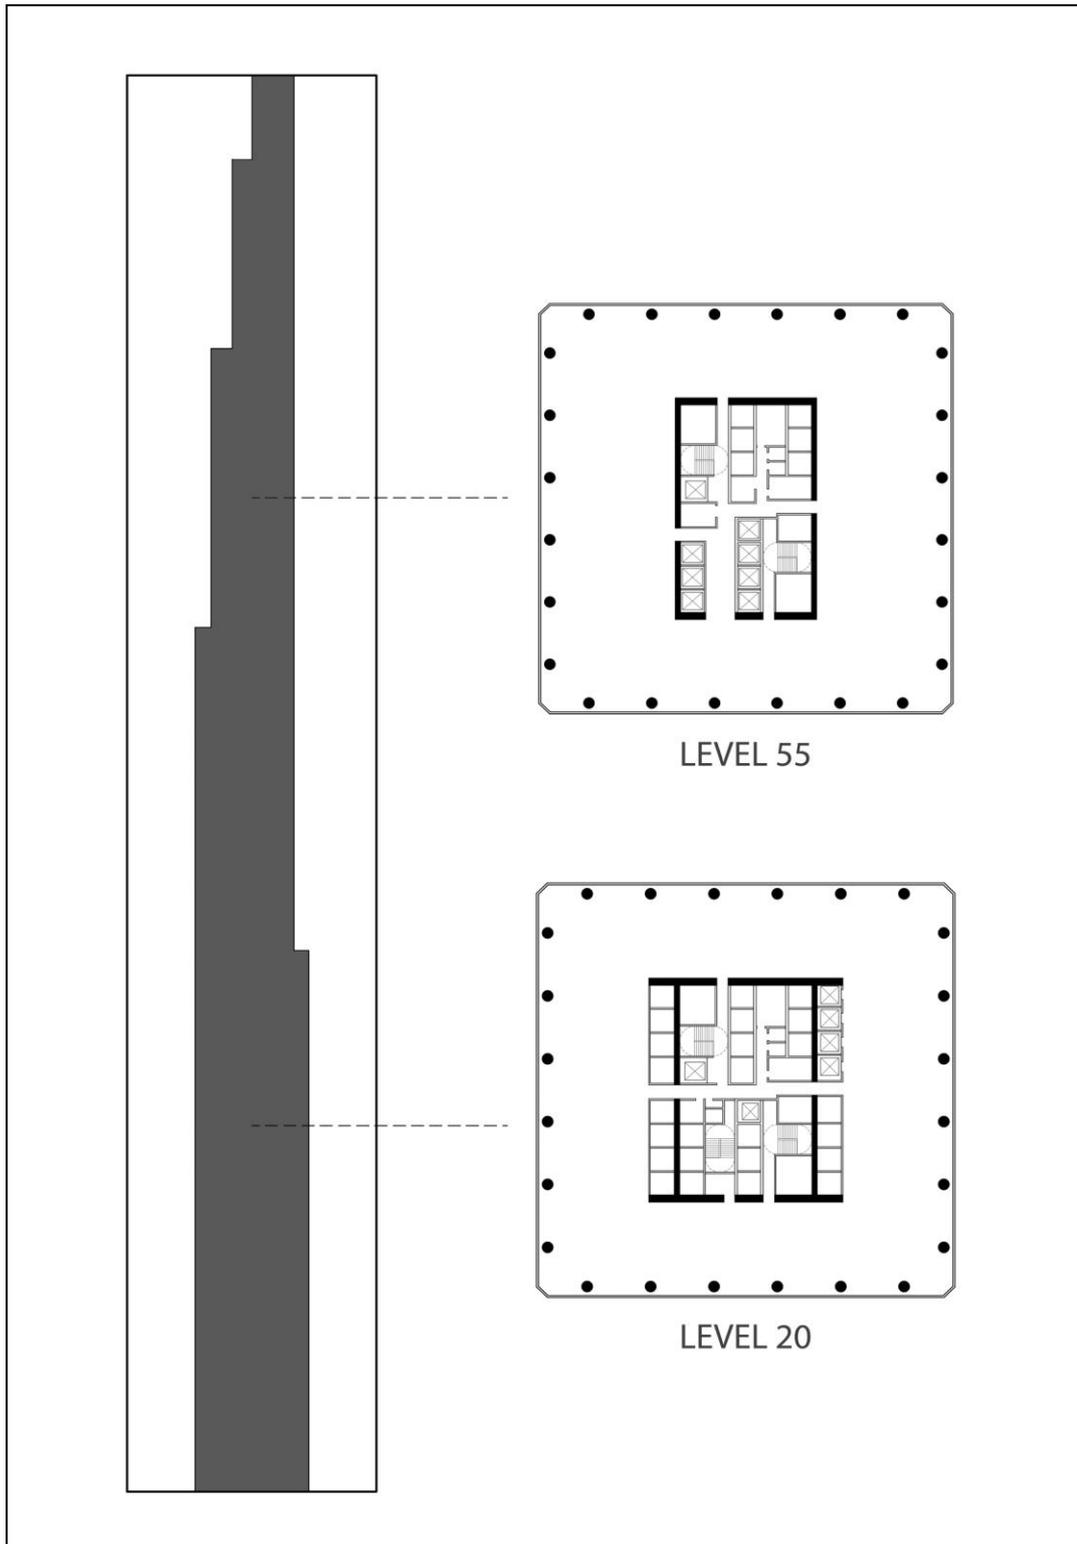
Section and floor plans of Cheung Kong Centre (Drawing by Zeynep Keskin)
